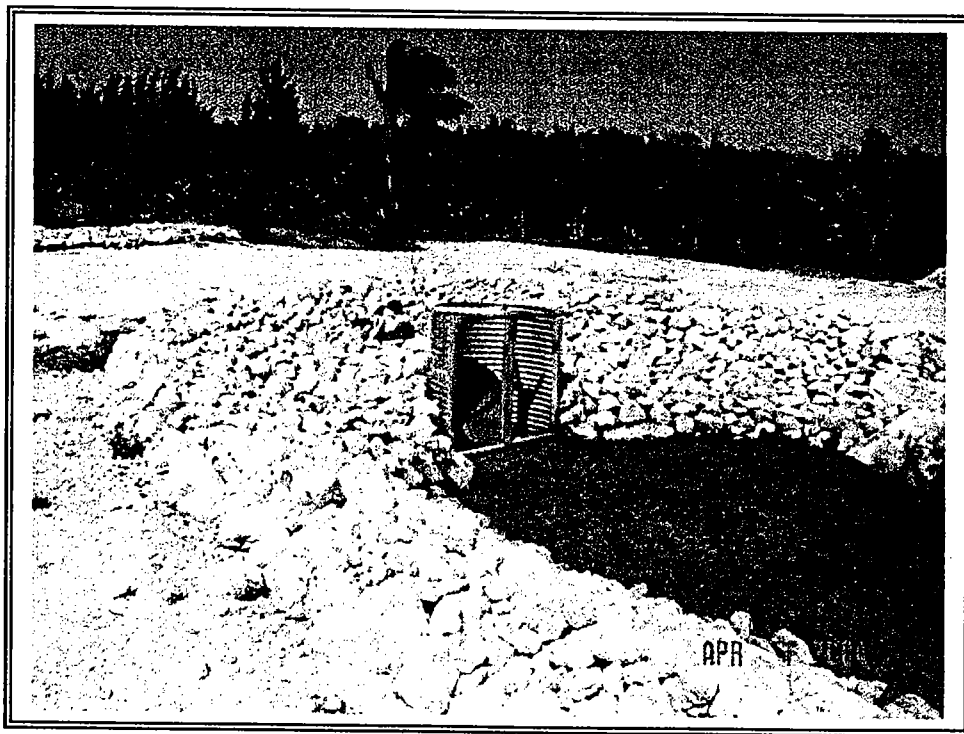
Photograph of internal road crossing and drainage control structure.
